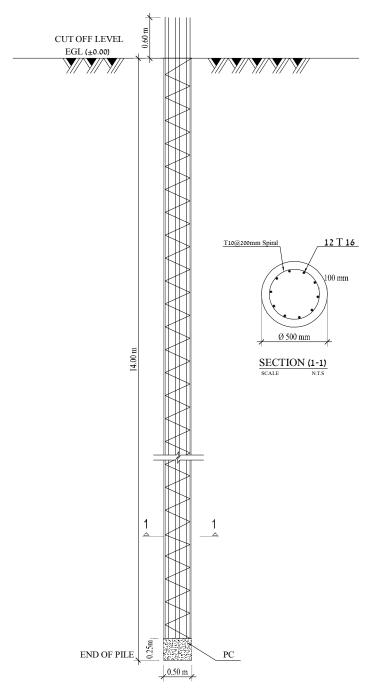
Schematic diagrams of piles cross section and length for site S-02
